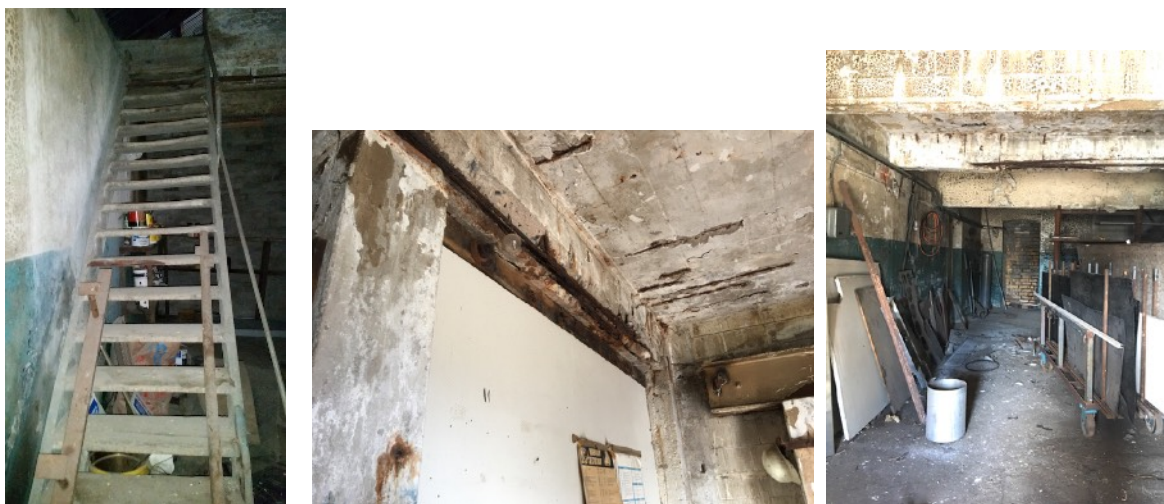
Areas E and F. c1931 building located behind the 1931 office building. The timber staircase, located in AREA E goes to the first floor in AREA K. The other two views are of AREA F.
